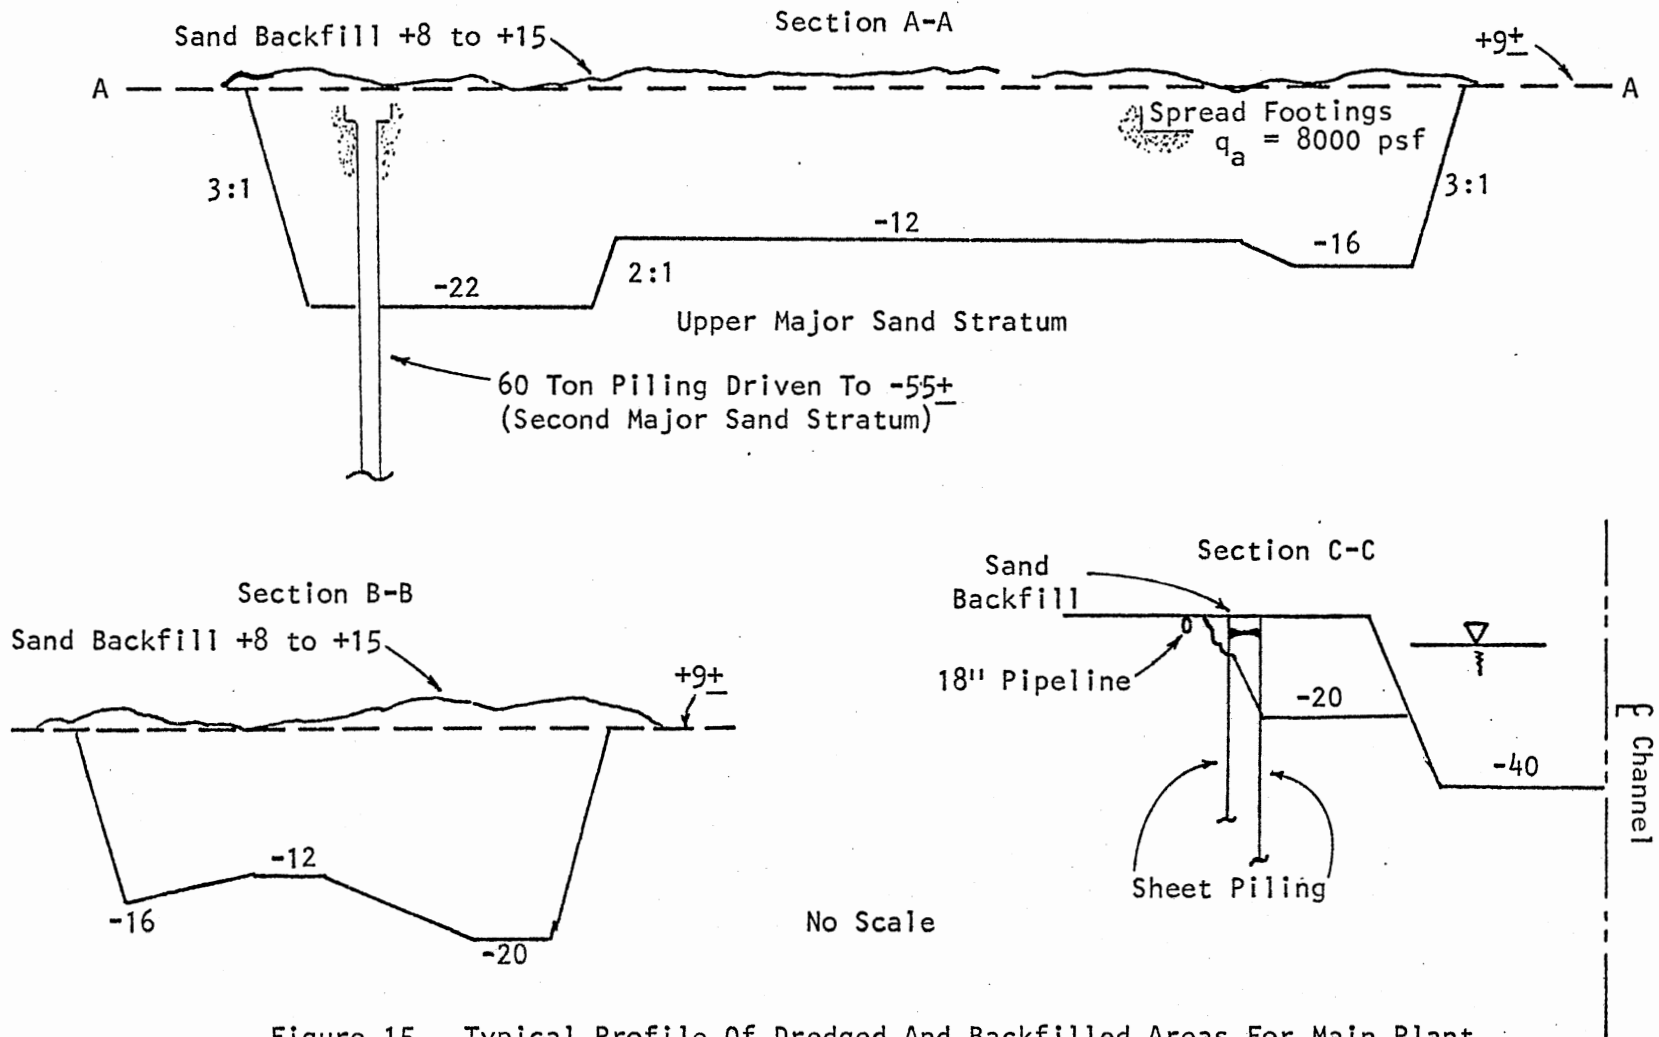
Typical Profile Of Dredged And Backfilled Areas For Main Plant
